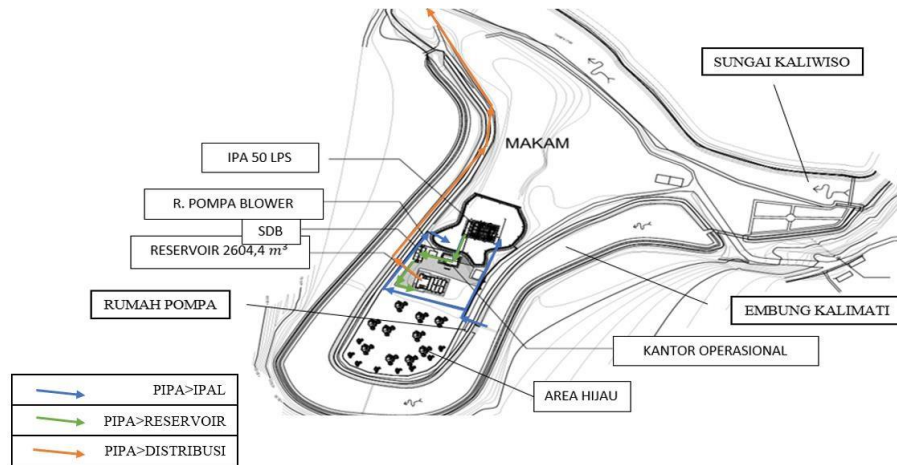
Layout Plan for the Development of the Kalimati Reservoir and Supporting Facilities
